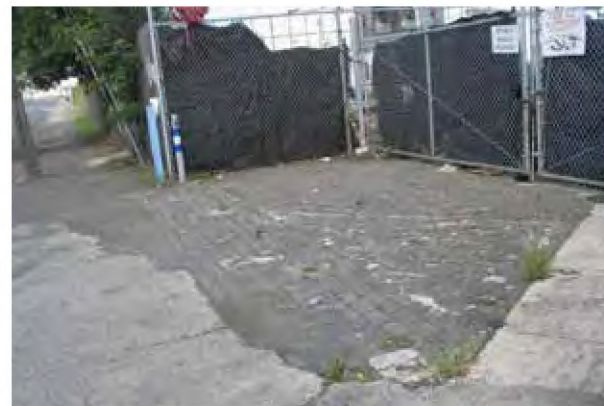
O'ahu Railway & Land Company Basalt Paving Blocks
